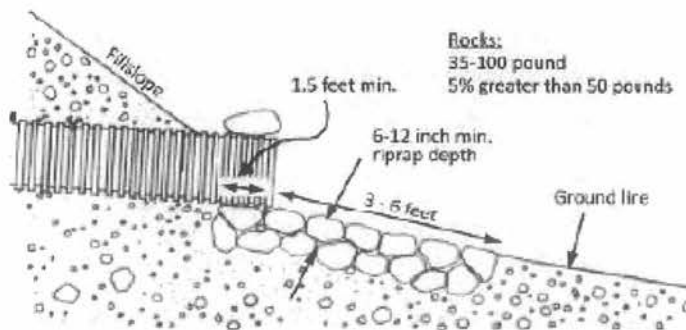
A. Riprap armor at culvert outlet (Modified from: Keller et al., 2011).
